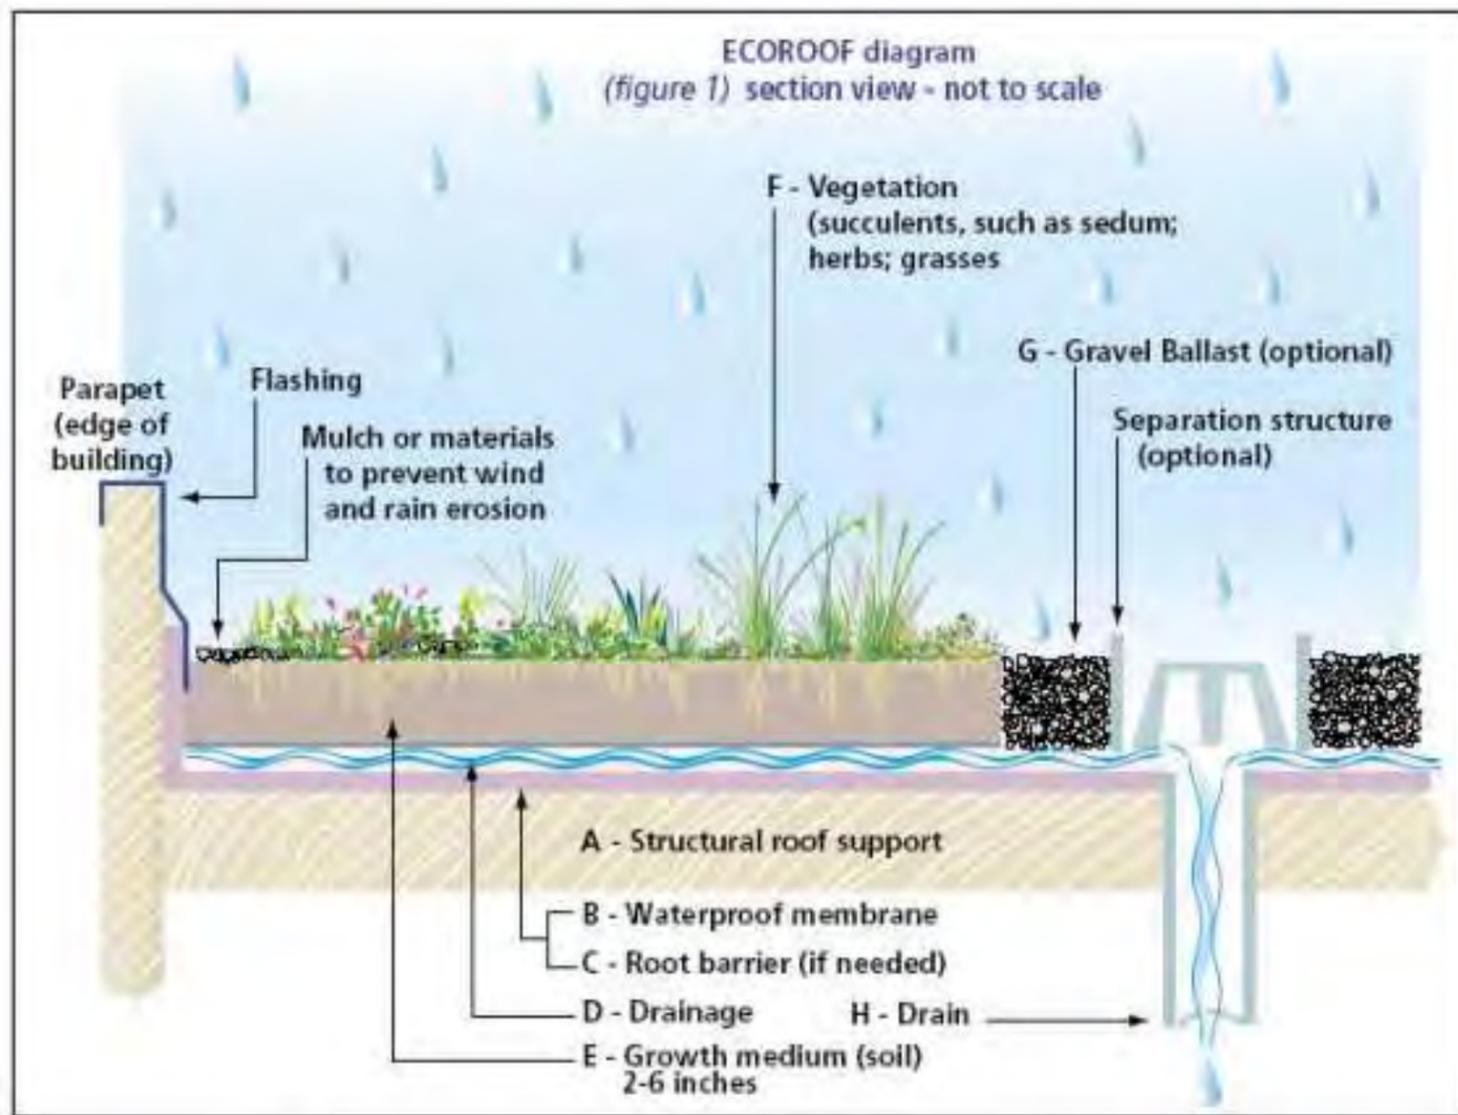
Green Roof Cross Section (from City of Portland, Oregon)
